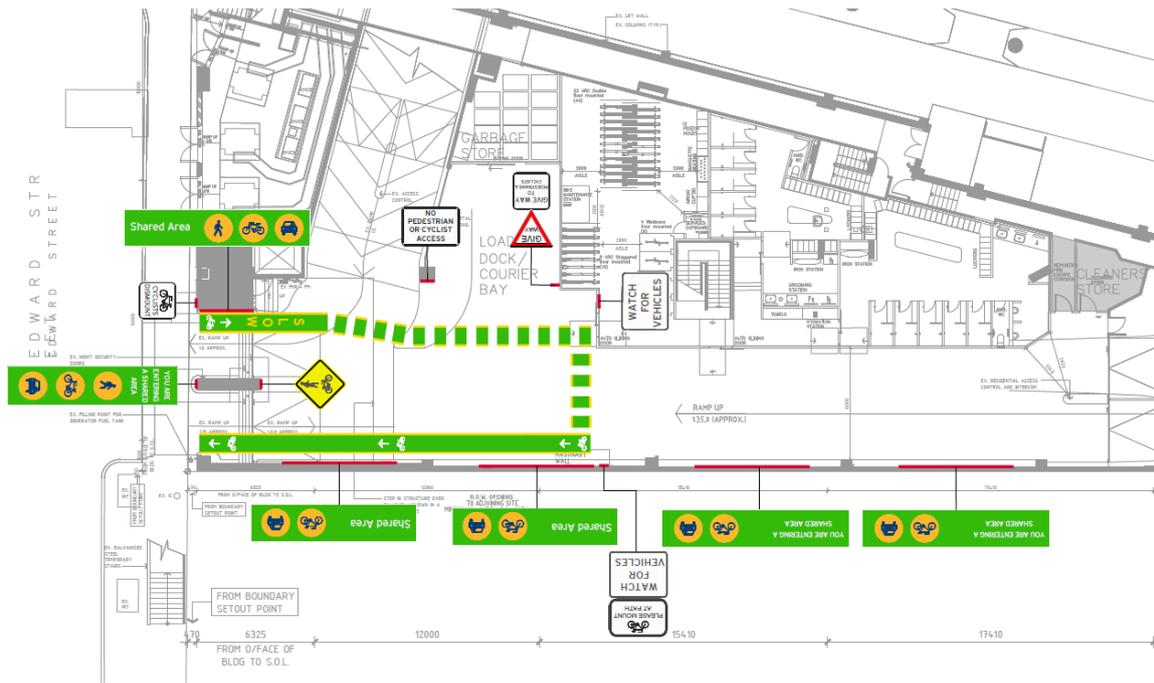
Extract from the amended Traffic and parking Statement showing proposed line marking and signage within the shared zone.
